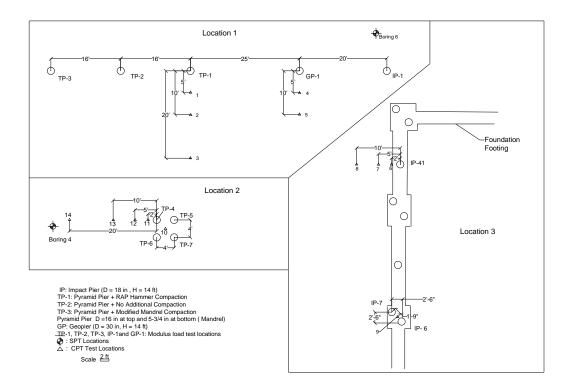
Minneapolis, MN: IRAP, TMRAP, and Geopier layout and CPT and SPT locations
